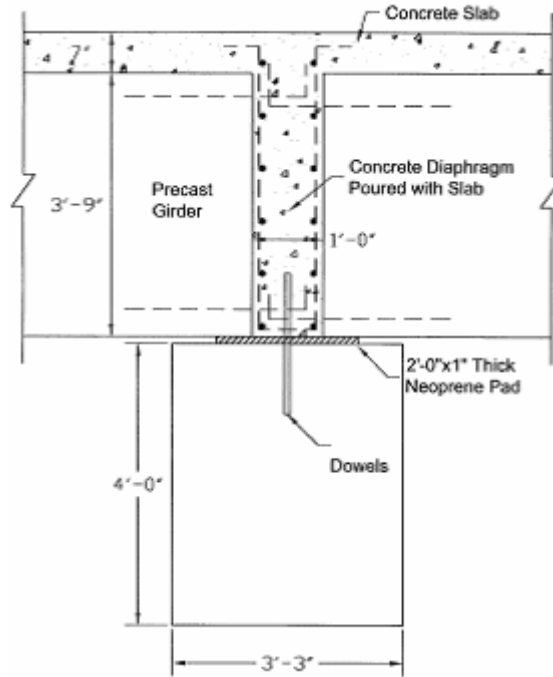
Detailing of connections between beam cap, bearing, and girder(After Hwang; 2001).
